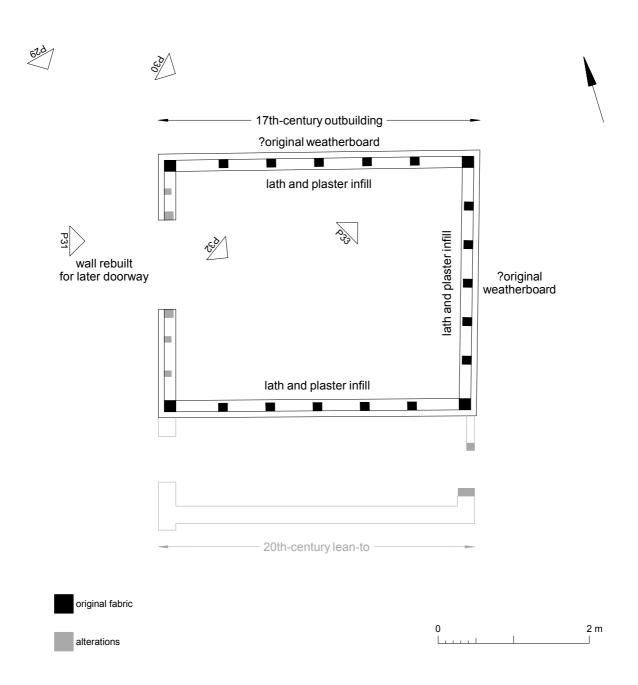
Floor plan of structure 5 (17th-century outbuilding), showing the location and orienation of photographs included in this report.
